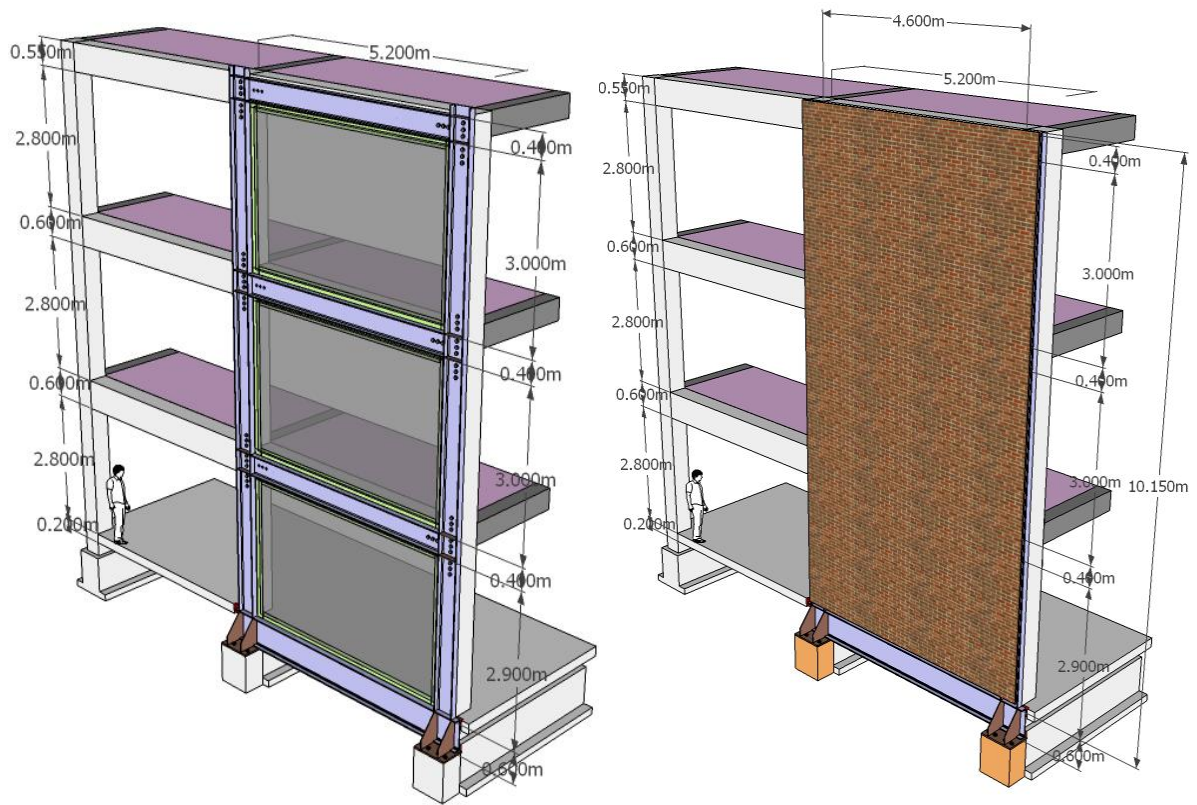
Proposed externally mounted LGS-SW: (a) details, (b) covered with fake masonry façade
